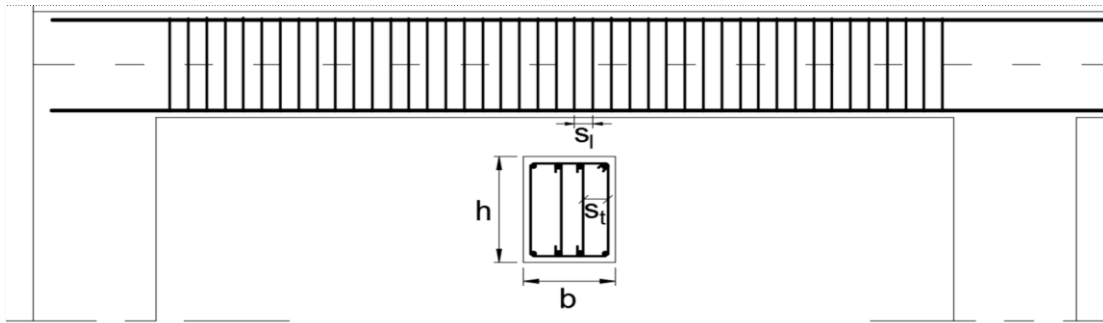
Illustration of the maximum longitudinal spacing and maximum transversal spacing of the legs
